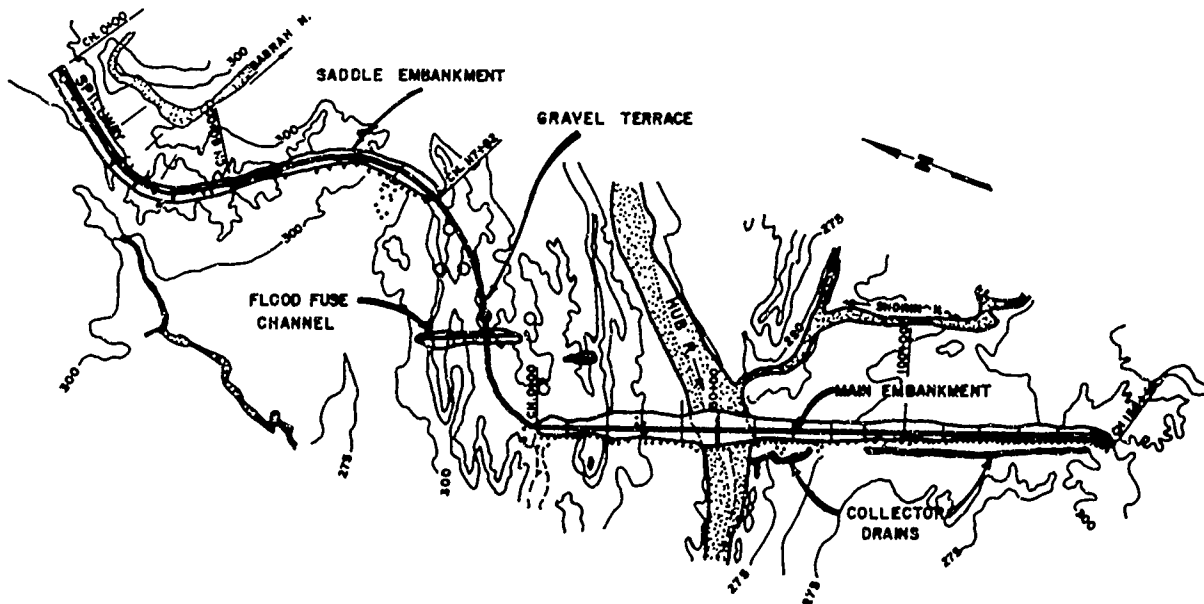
HUB DAM PROJECT - LAYOUT PLAN
